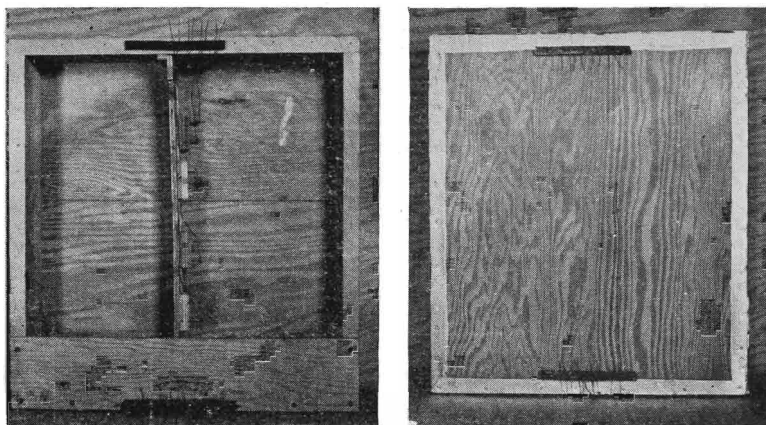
Photos of sample frame walls similar to those used in the tests. (Left photo shows a cut-away section showing mounting of moisture points. Right photo shows a completed wall ready for test.)
